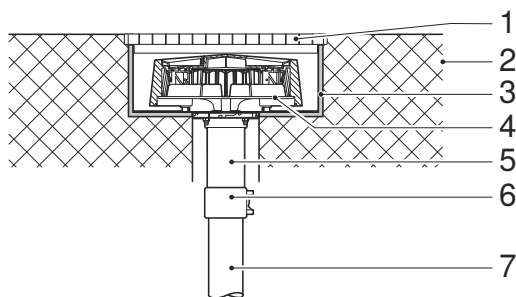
Installation in concrete roof without waterproofing layer, suitable for promenade or parking decks
